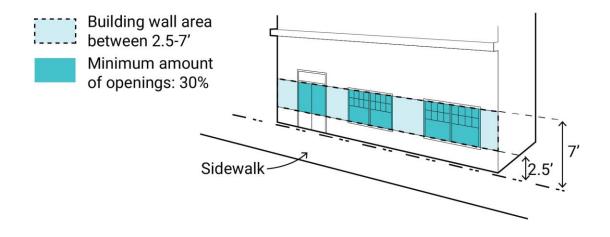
(B)(6)(c): Window opening and transparency, residential common spaces
